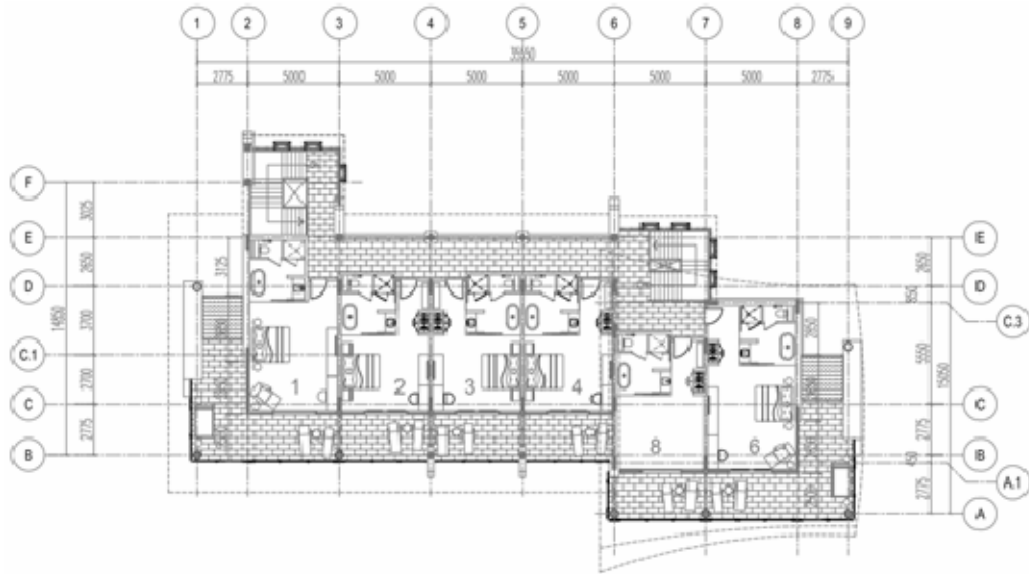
Typical Room Floor Plan for Hotel
